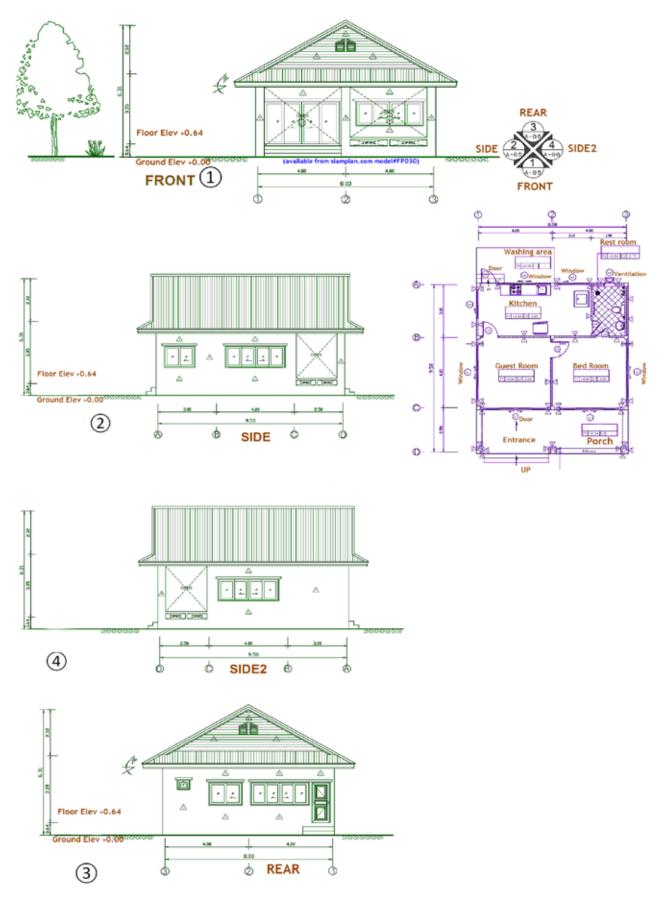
A simple house used in this study with floor plan. Source:www.siamplan.com model#FP030.
